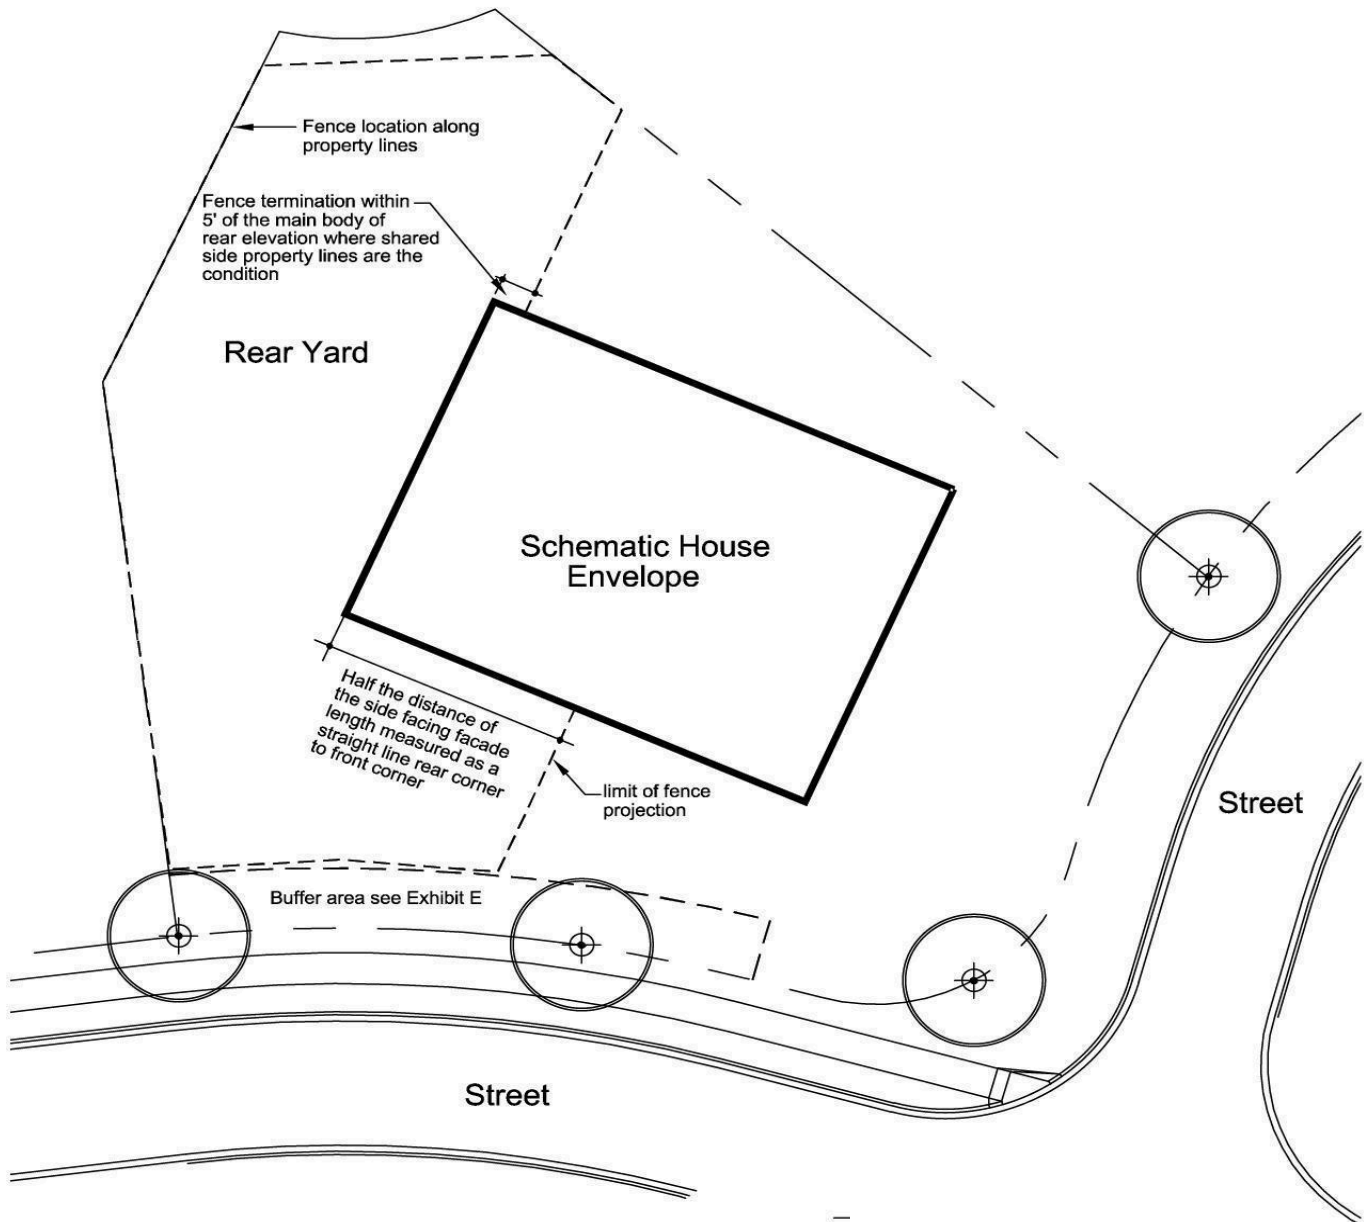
EXHIBIT G – REAR & SIDE YARD BUFFER CONFIGURATION – NON-CORNER & CORNER LOT CONDITION
